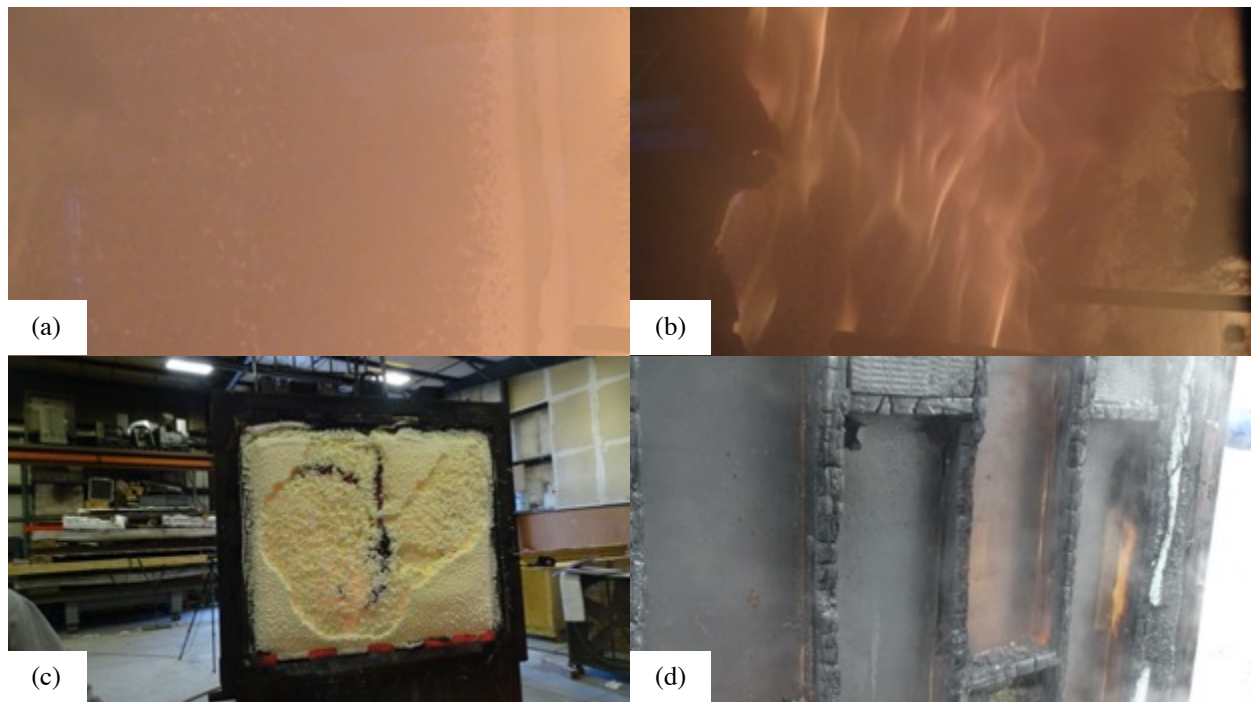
Test 2 wall assembly showing (a) intumescent – 1 min, (b) flaming – 2 min, (c) from furnace, and (d) remaining studs.
